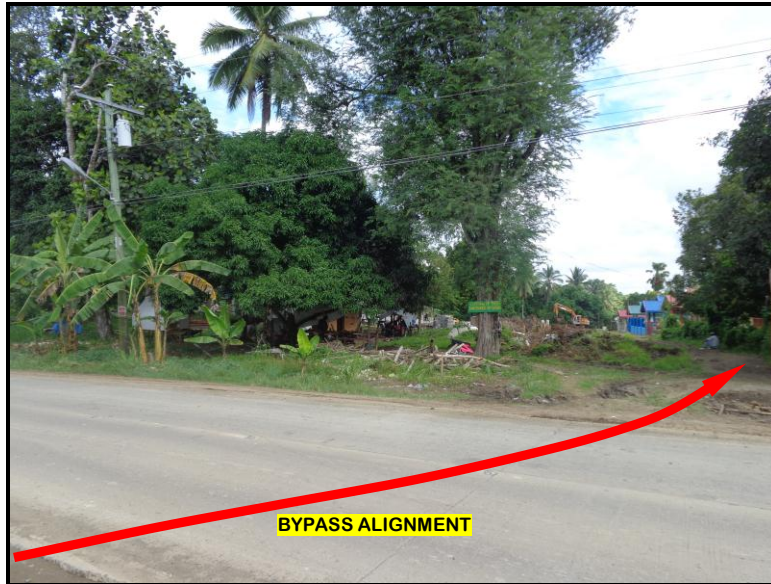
Bypass alignment intersecting the Cabantian Road between Sta. 25+500-25+600 in Brgy. Cabantian.
